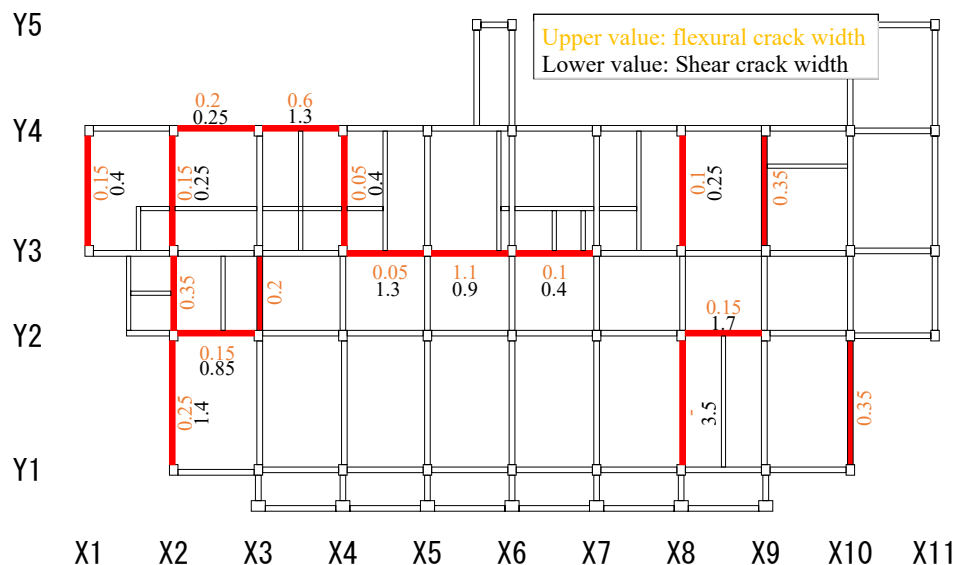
Damage of Wall on first floor (Second investigation, student team)
